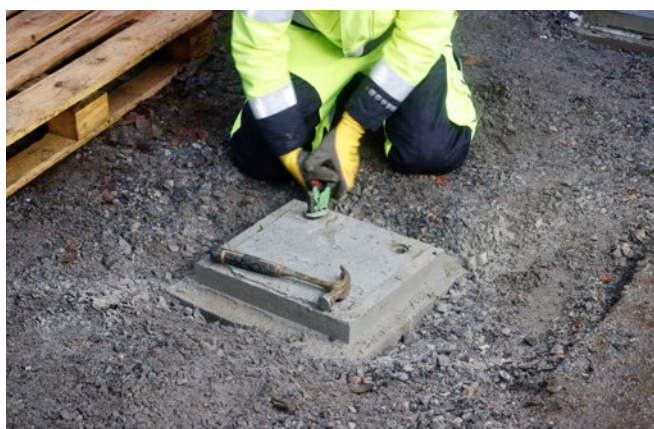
M16 THREADED BARS OF COPRA® ANCHORING COUPLERS ARE BEING UNSCREWED
